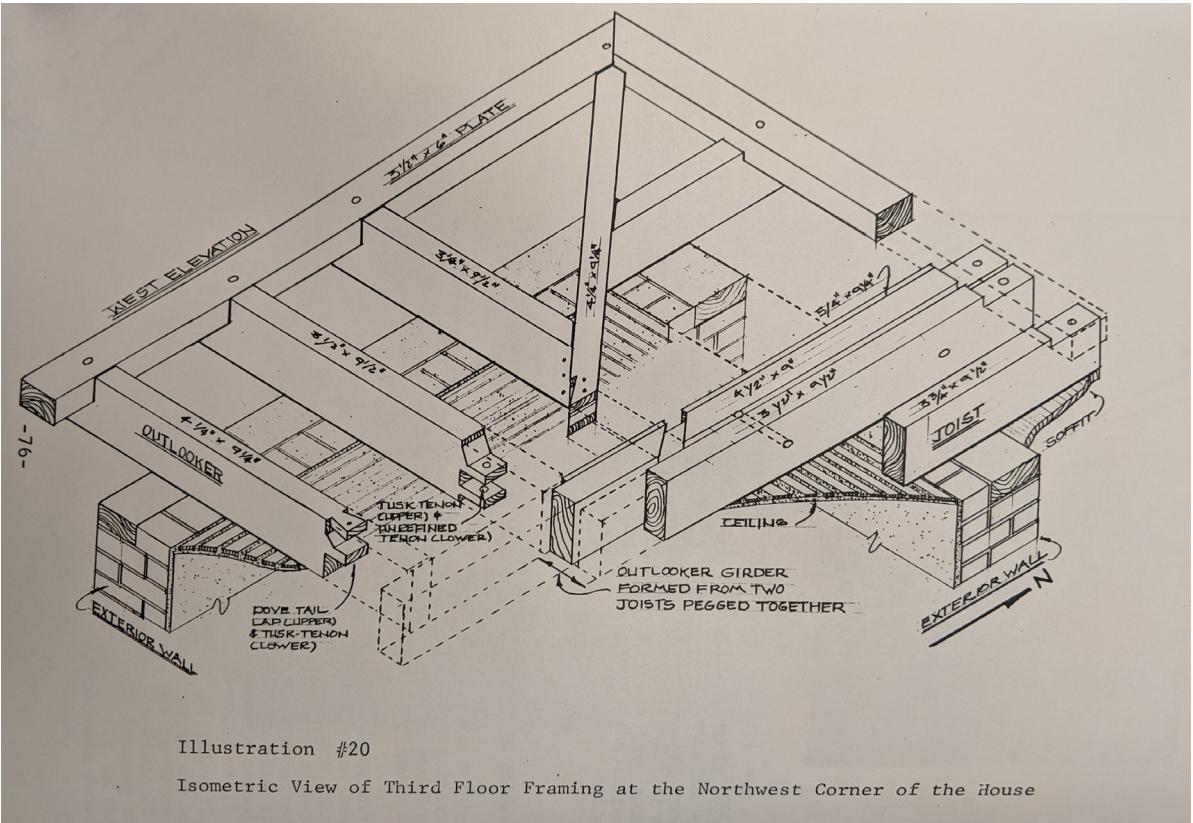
Dickey layout of 3rd floor ceiling joists from outlooker to plate. Source: Stenton HSR
